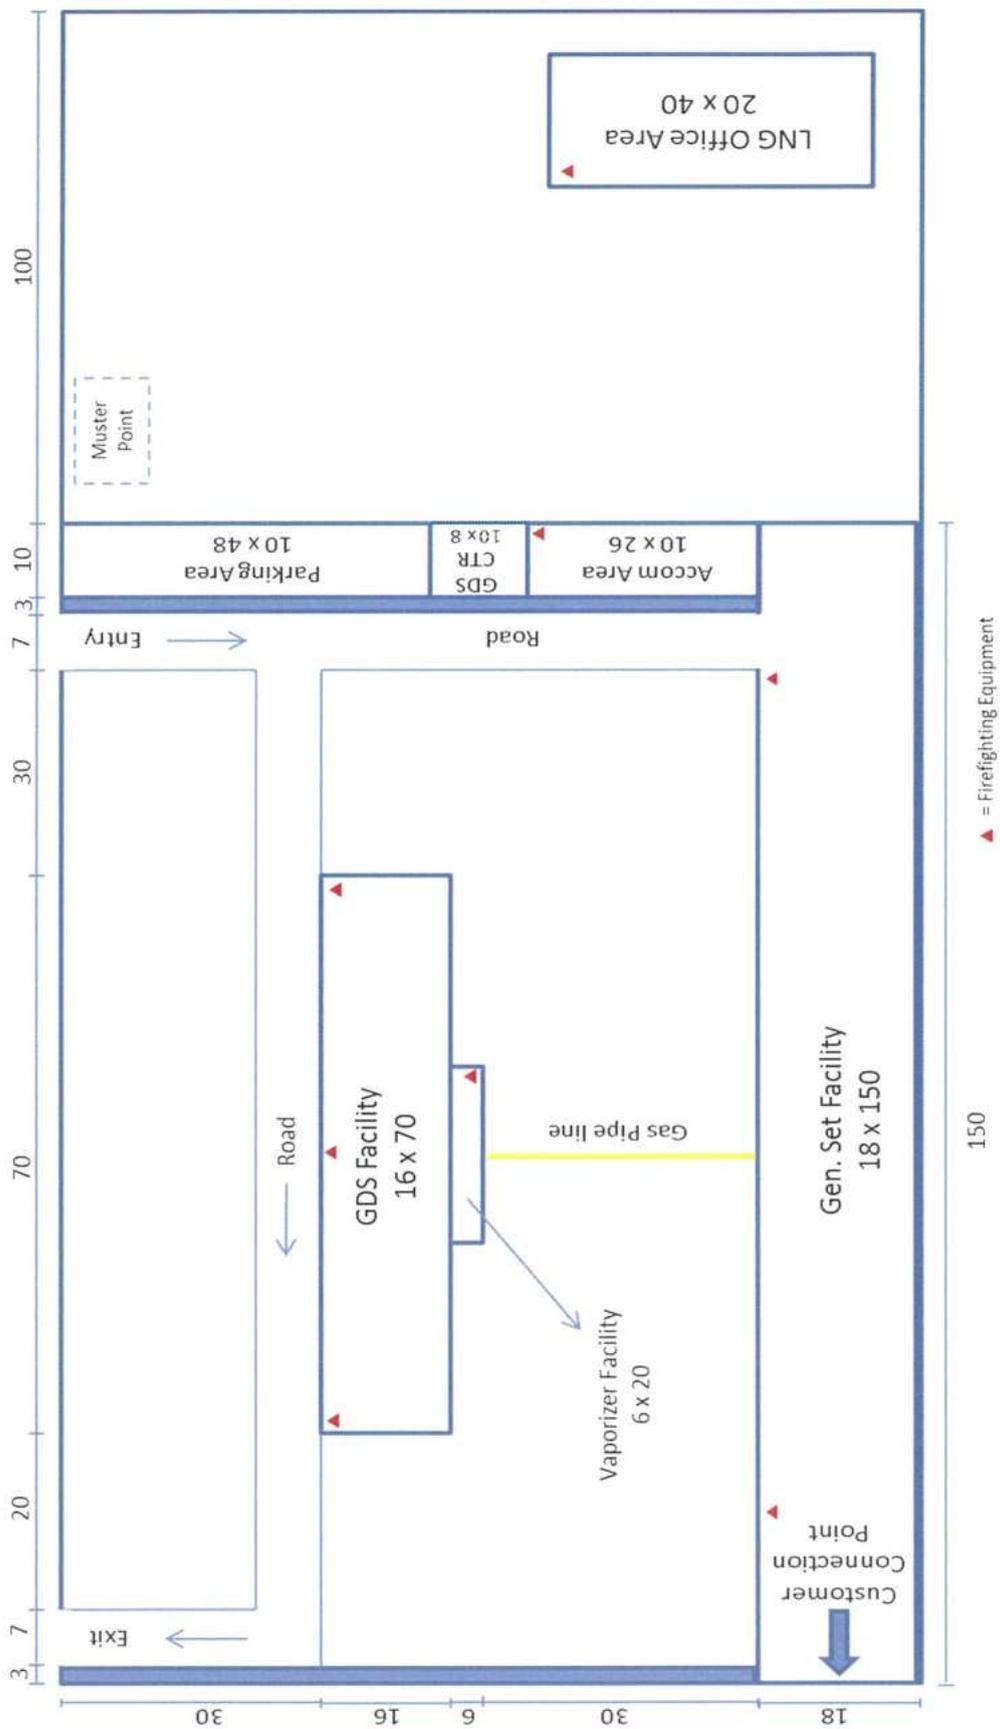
LAYOUT OF PROPOSED 15 MW TEMPORARY POWER PLANT
